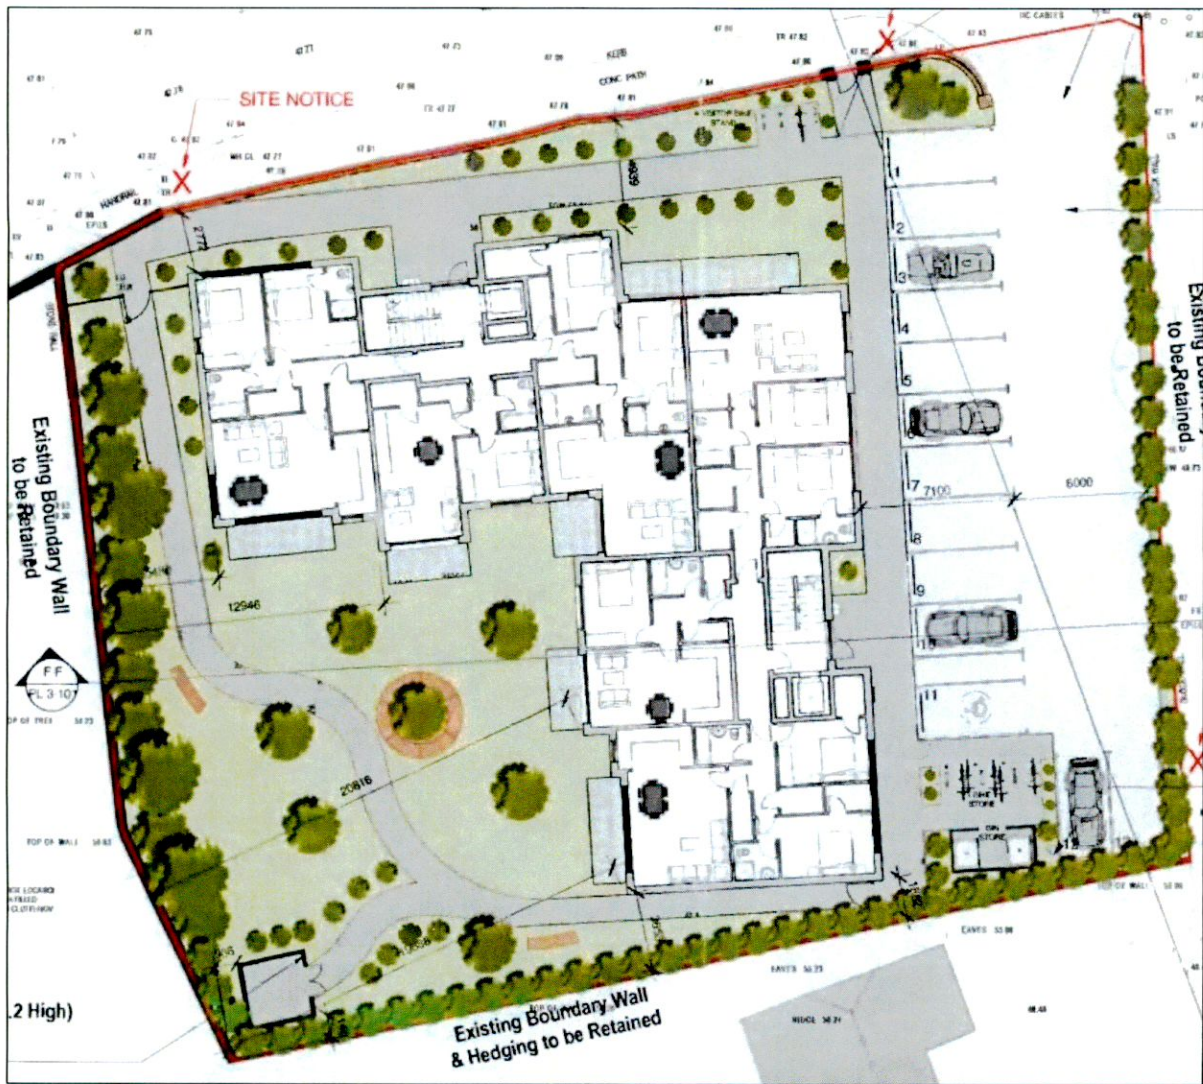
Proposed site layout plan under Reg. Ref. SD19A/0198, as refused.
